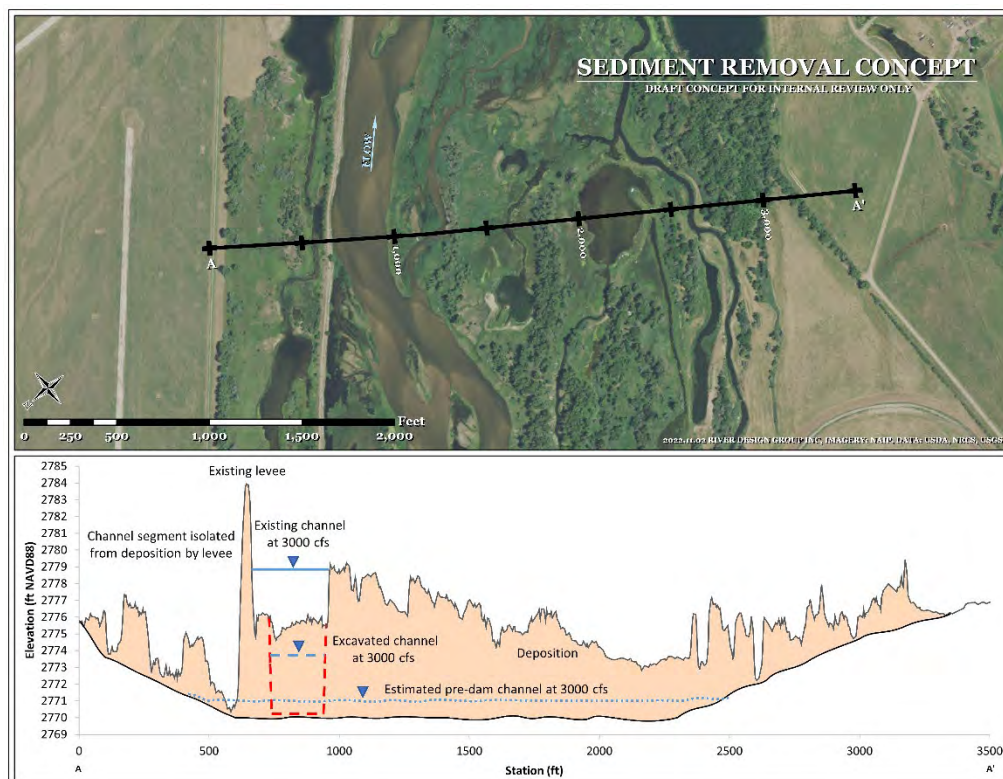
Cross section exhibit illustrating a sediment removal concept for the Chokepoint Reach. Cross section location noted on plan and profile exhibit.
